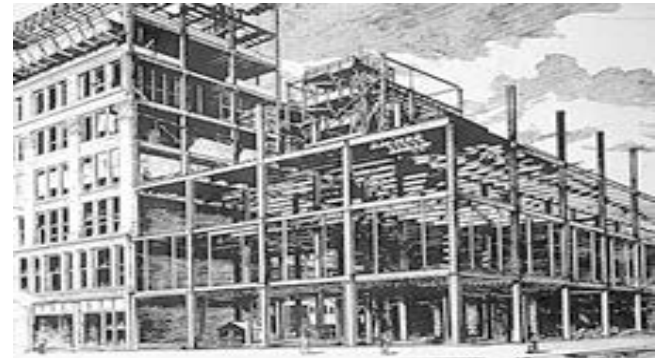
Home Insurance Building, William Lu Baron Jenny, Chicago, United States of America: the building had no load bearing wall and all weight of the building was imposed on its steels structure.
